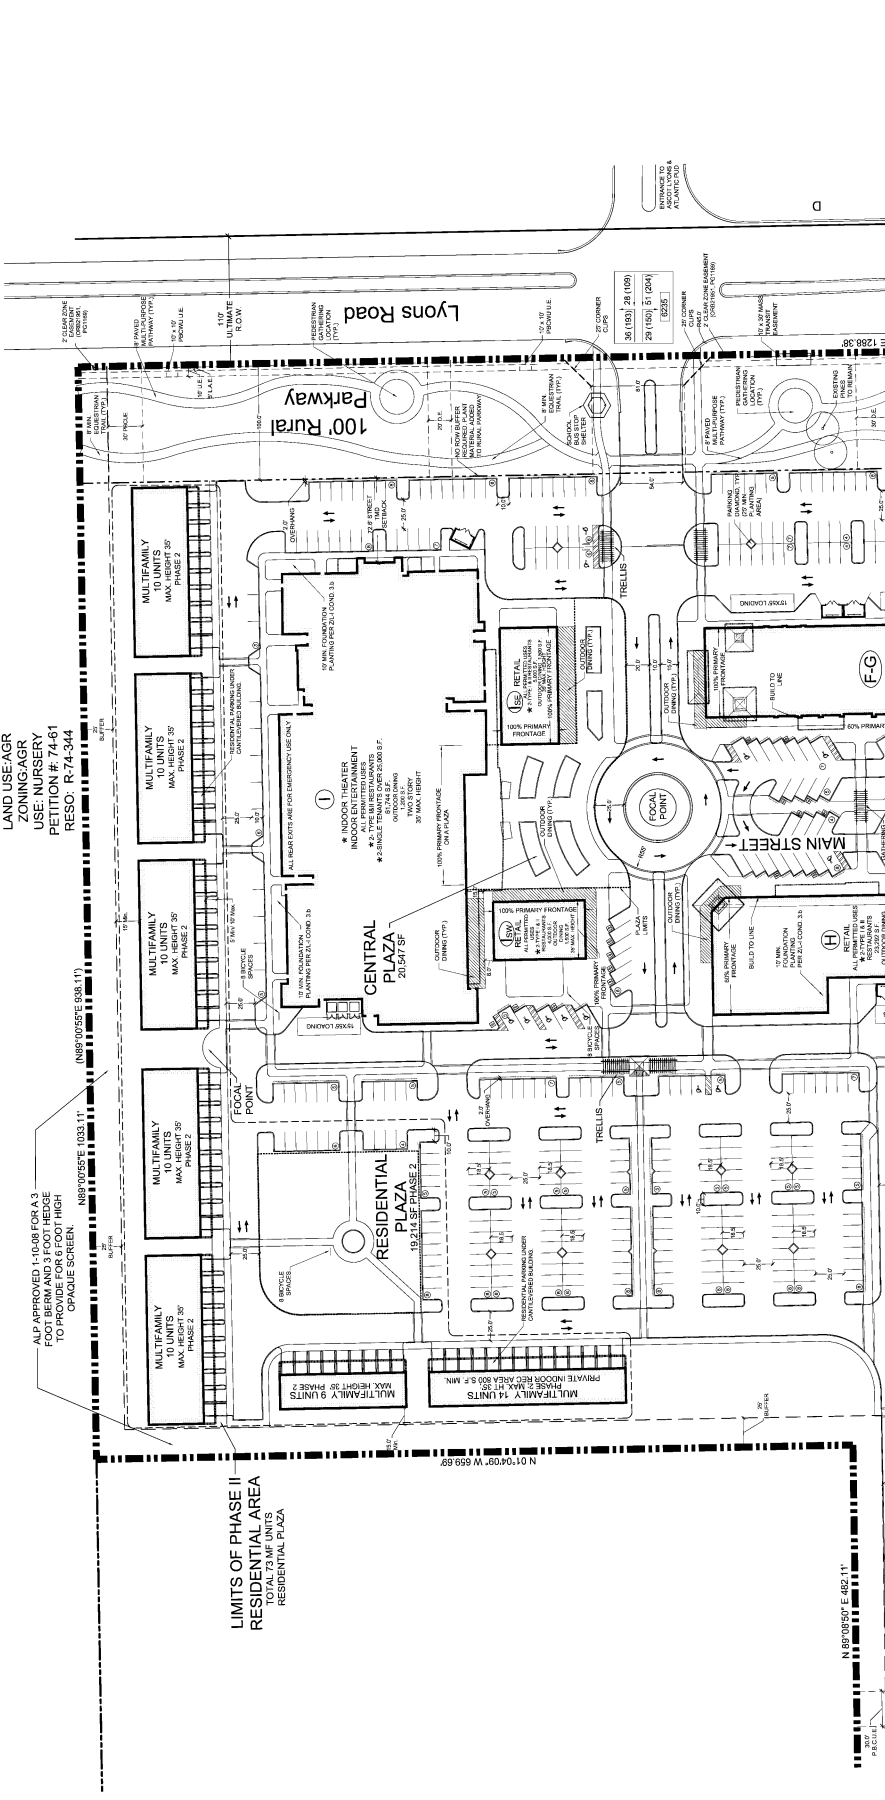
Preliminary Site Plan dated April 18, 2011, page 2
